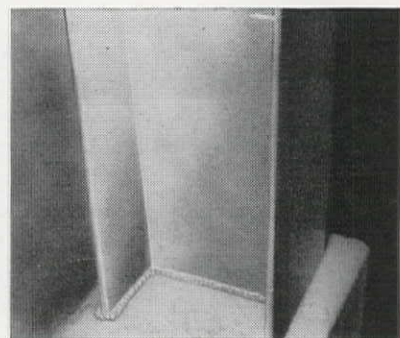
Column-to-Base Detail — Joint is welded in position after column is erected and plumbed.
